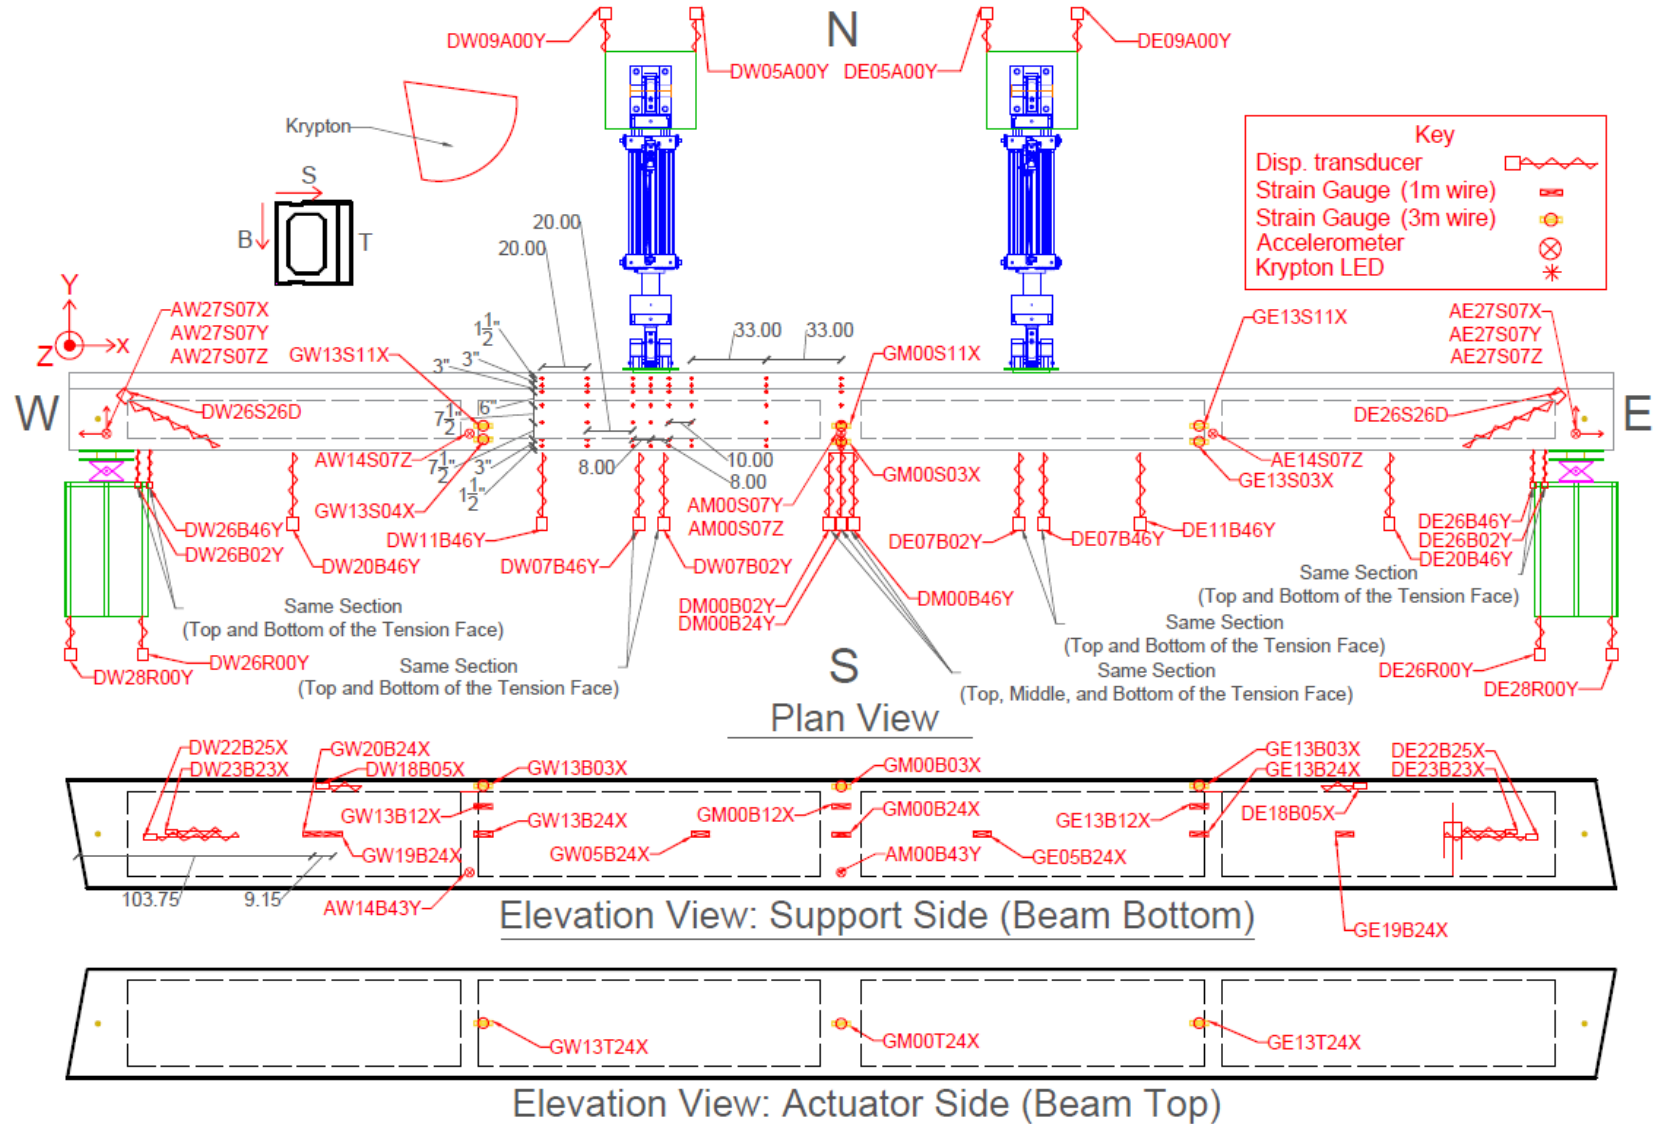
Beam 3 Instrumentation (capacity-level tests)
